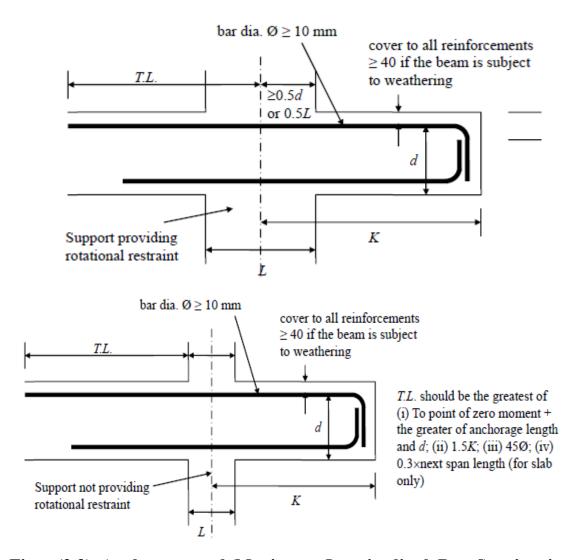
Anchorage and Maximum Longitudinal Bar Spacing in Cantilevers as Required by the Code and PNAP173
